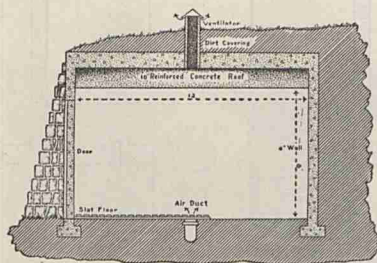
Longitudinal section of an outdoor storage cellar 12 feet long, built of concrete. The structure may be lengthened to increase the storage capacity, but if this is done additional ventilators must be provided.
